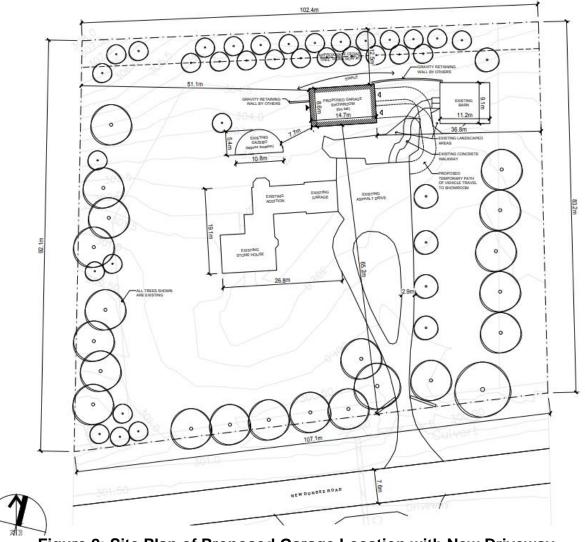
Site Plan of Proposed Garage Location with New Driveway
